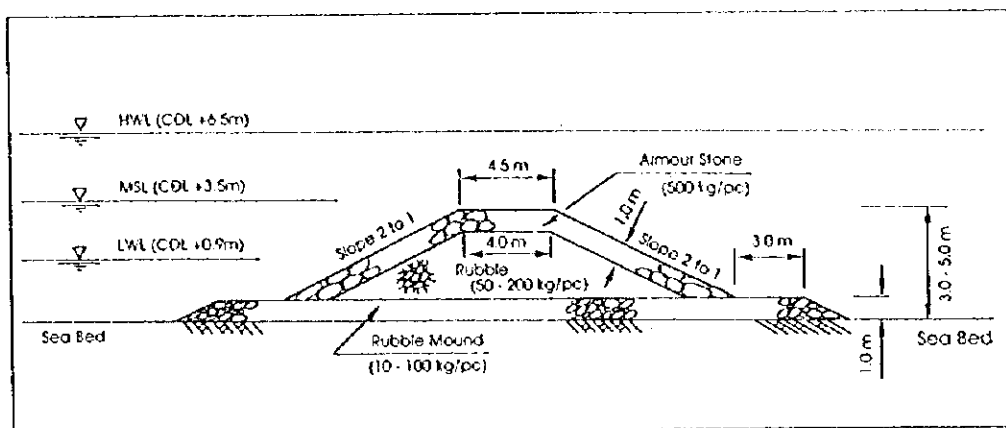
Typical Cross Section of Submerged Breakwater
